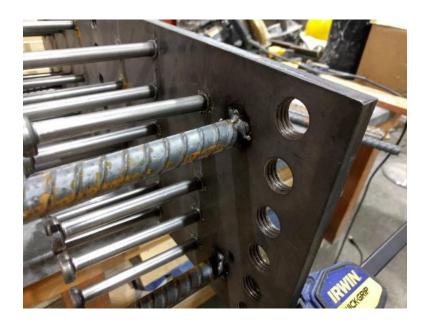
MIG-welded joint between #6 rebar and sample end plates.
